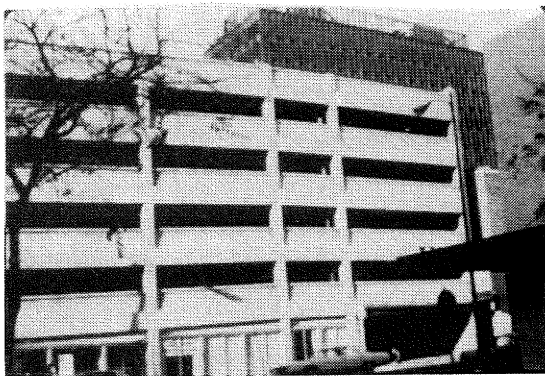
SPANDREL-WALL GIRDER - SHORT COLUMN SYSTEM PARKING GARAGE, BERKELEY
